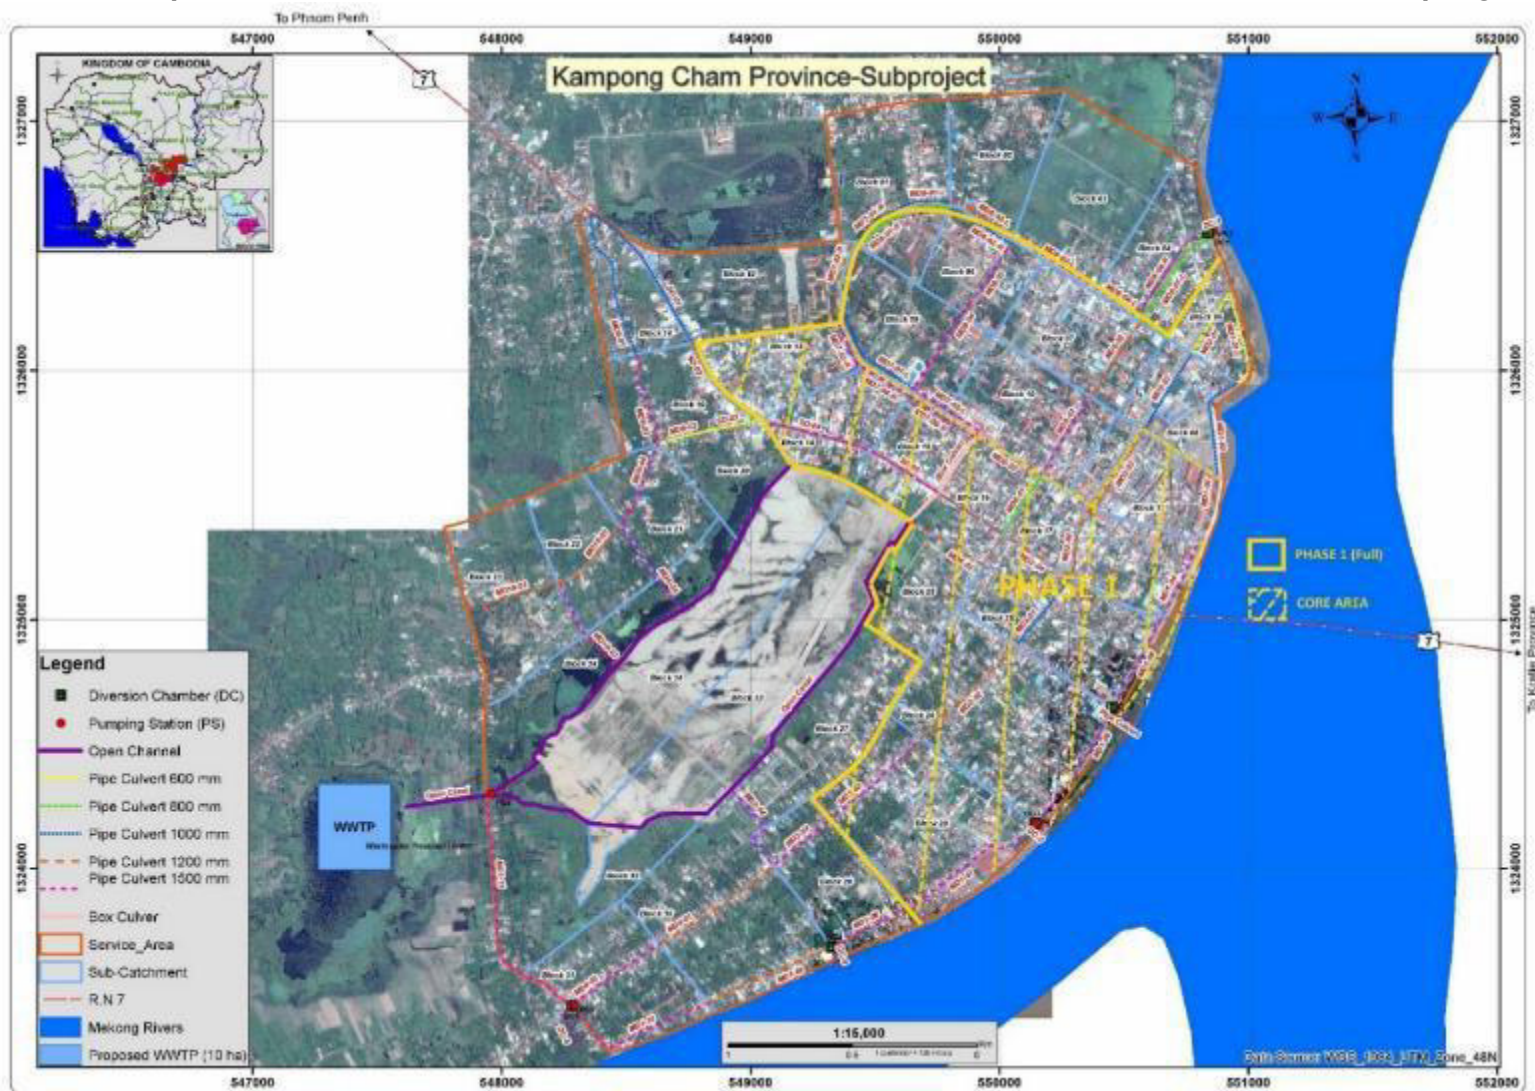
Conceptual Layout of the Kampong Cham Wastewater Treatment Plant
